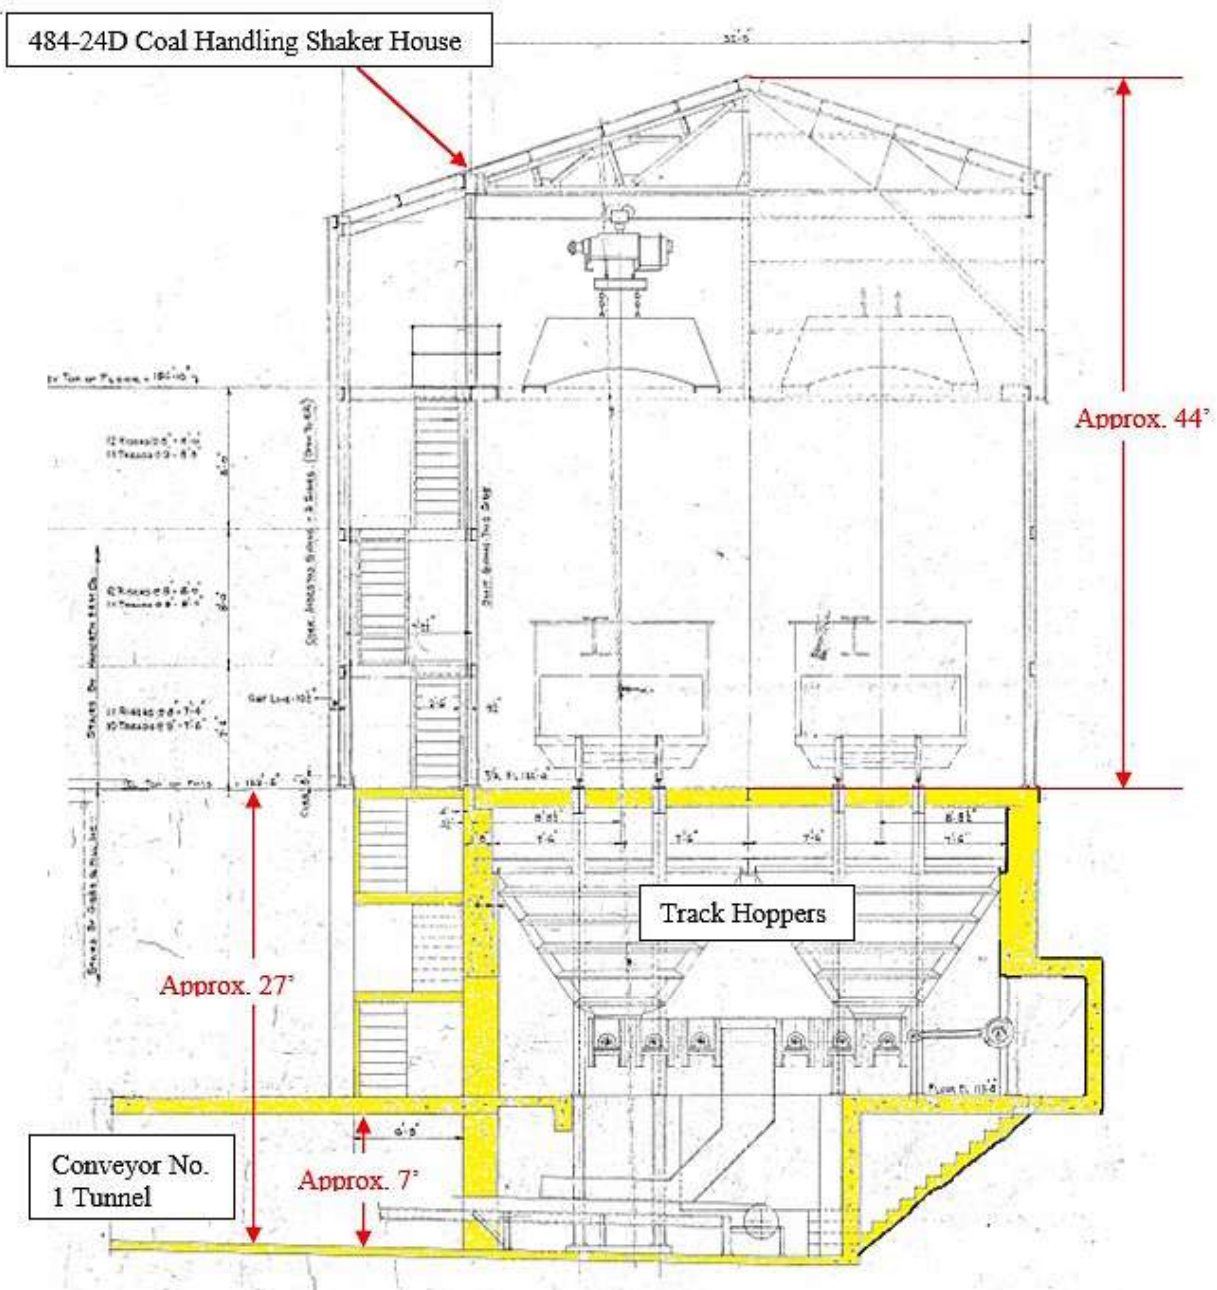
Elevation Dwg. of 484-24D Coal Handling Shaker House and Track Hoppers
